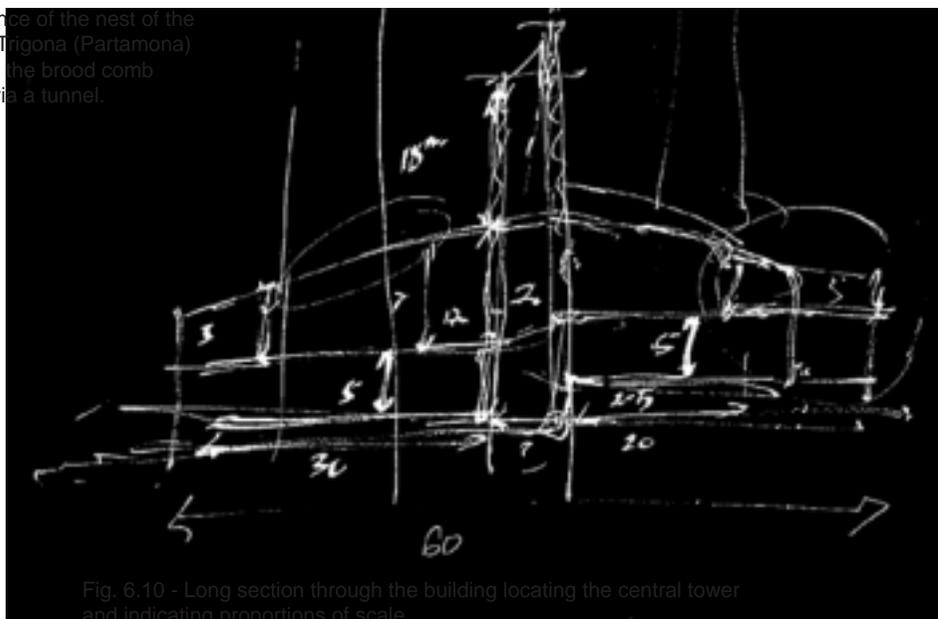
Long section through the building locating the central tower and indicating proportions of scale.
